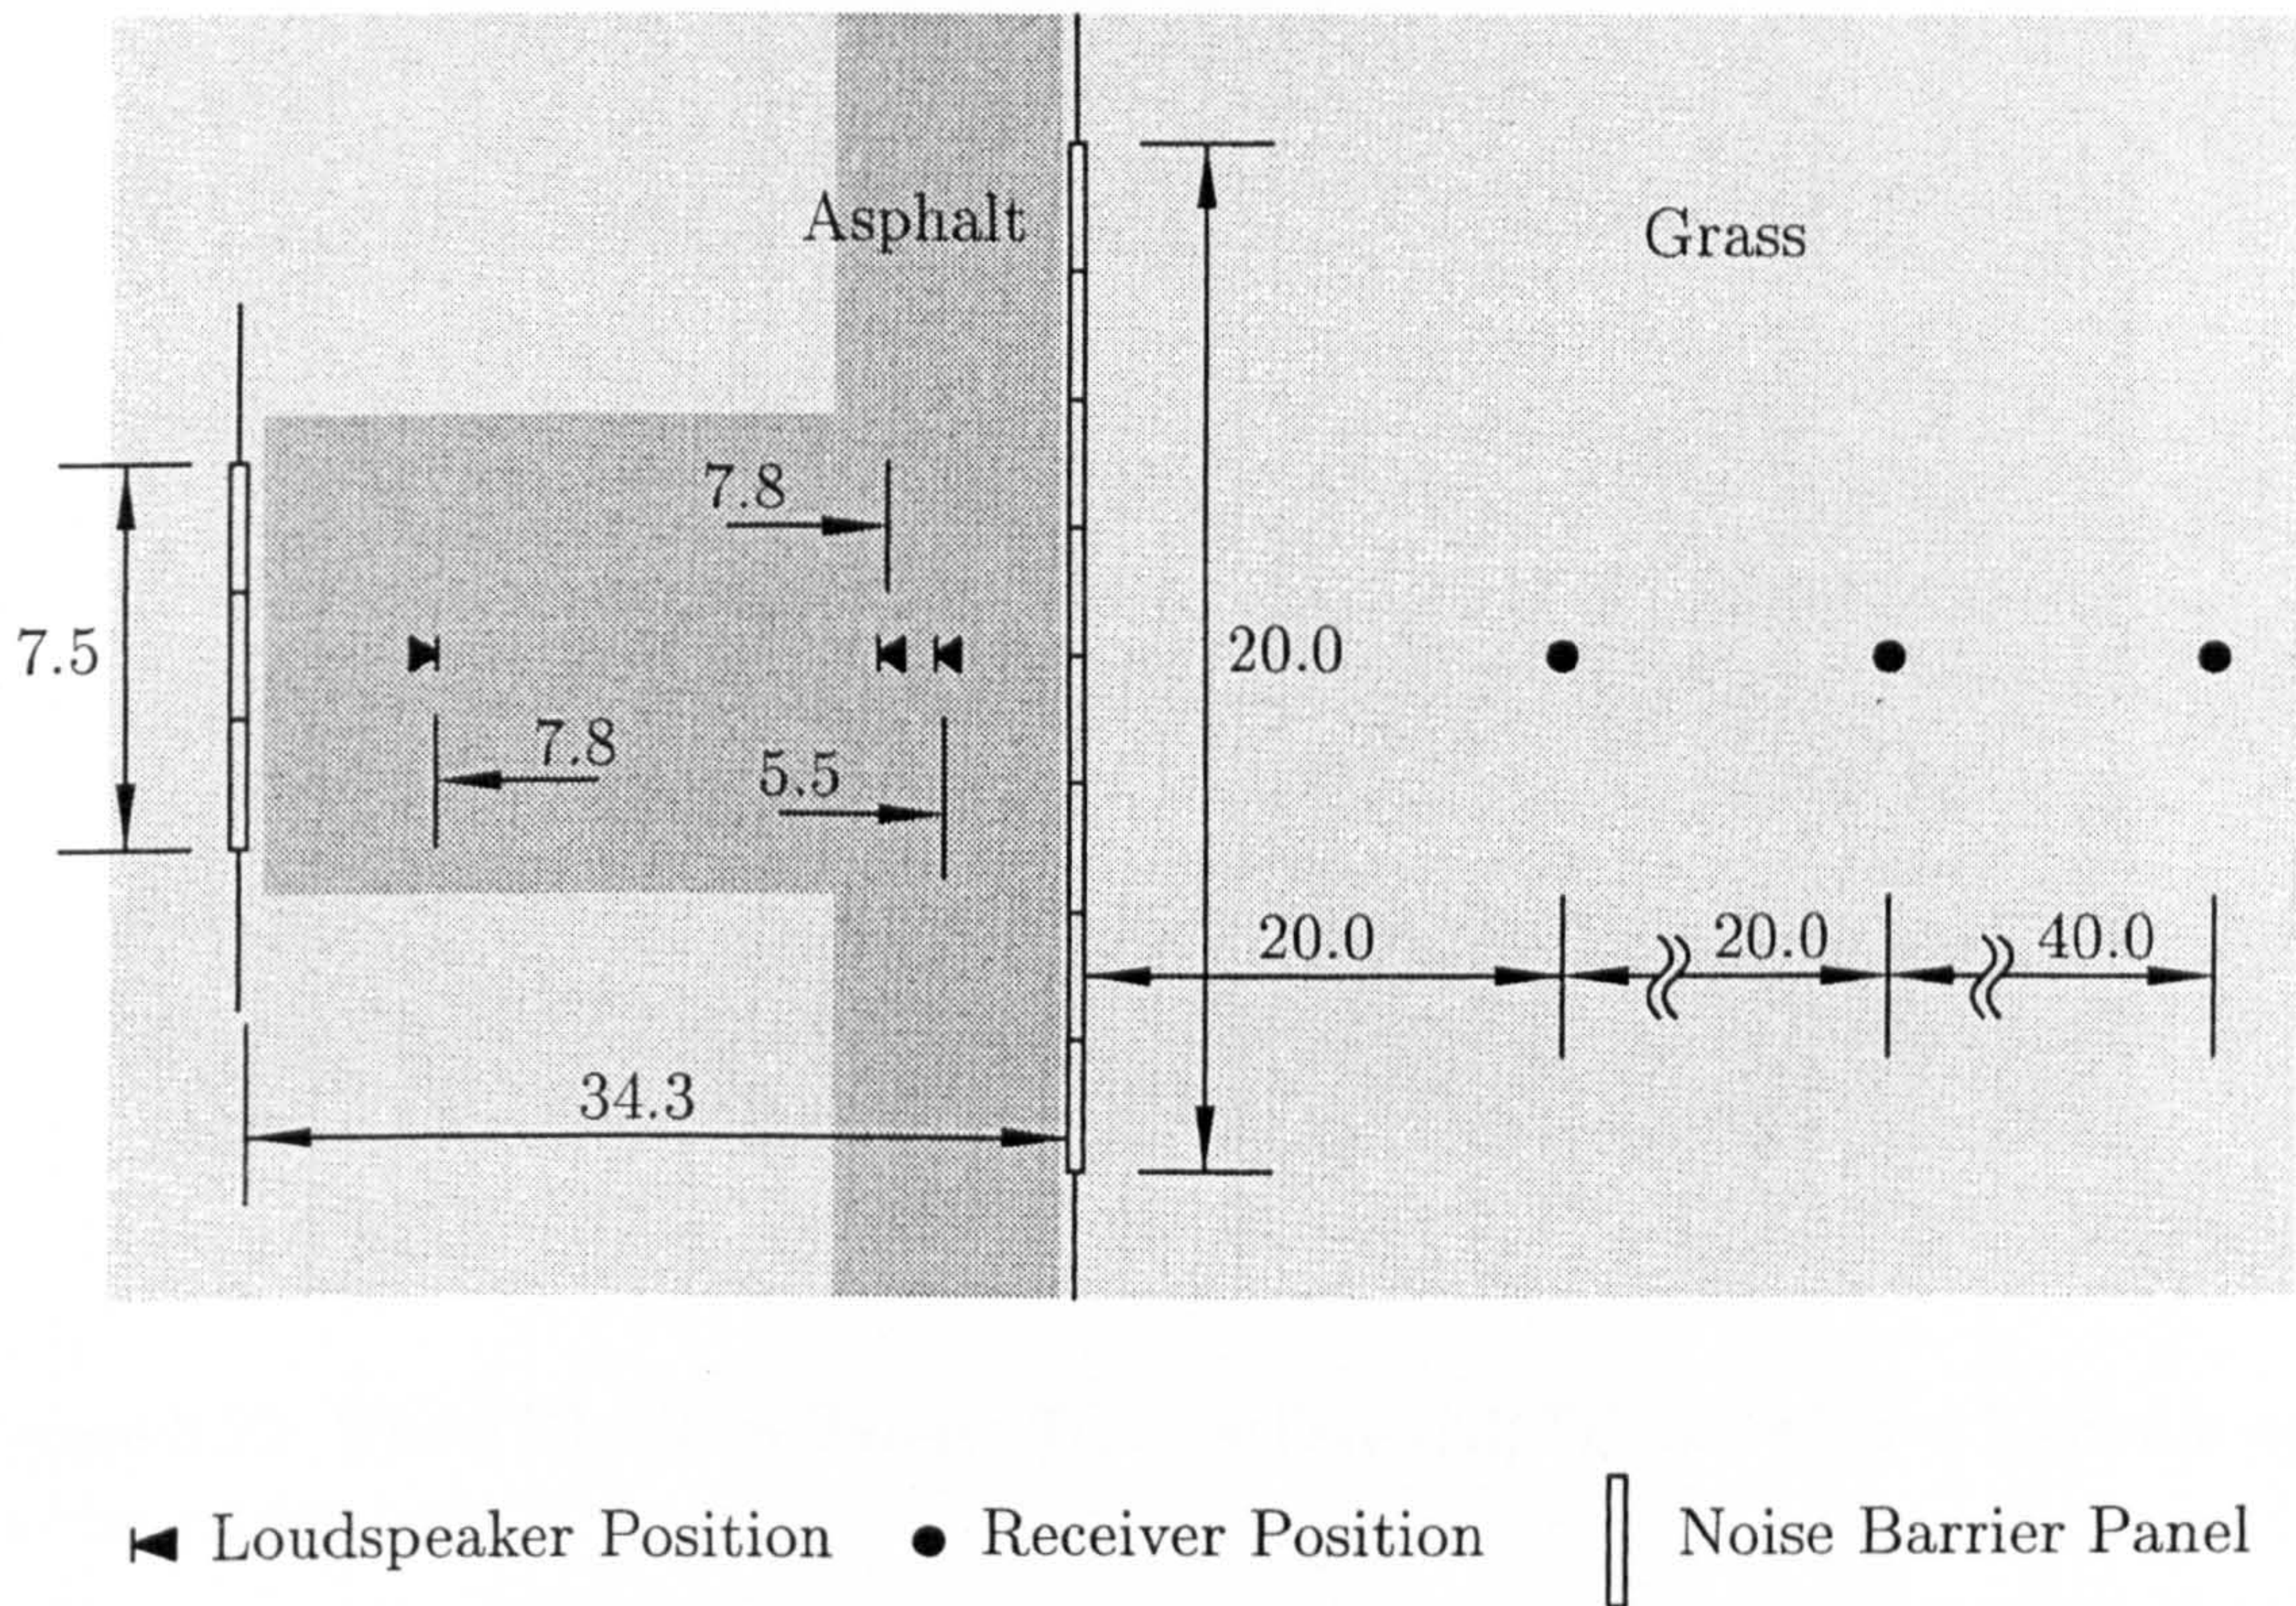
Plan of the TRL Noise Barrier Test Facility (NBTF). Dimensions in metres.
